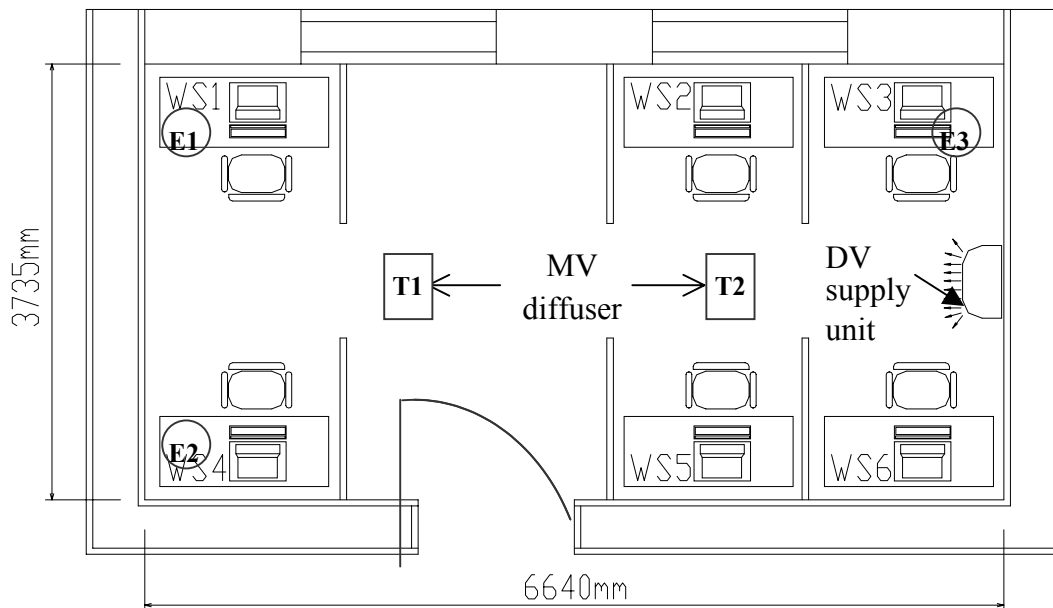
Thermal chamber layout. (Note: WS denotes workstation and E denotes extract grille.)
